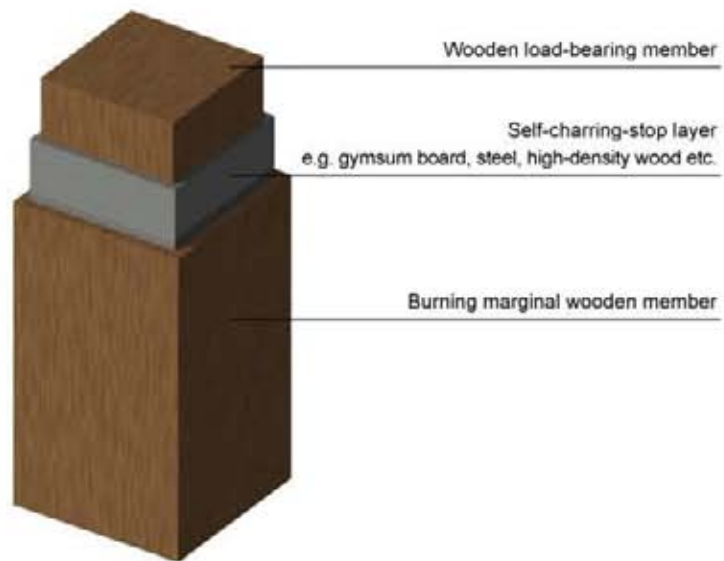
(2) Building members: Self-charring-stop layer installed in wooden member
